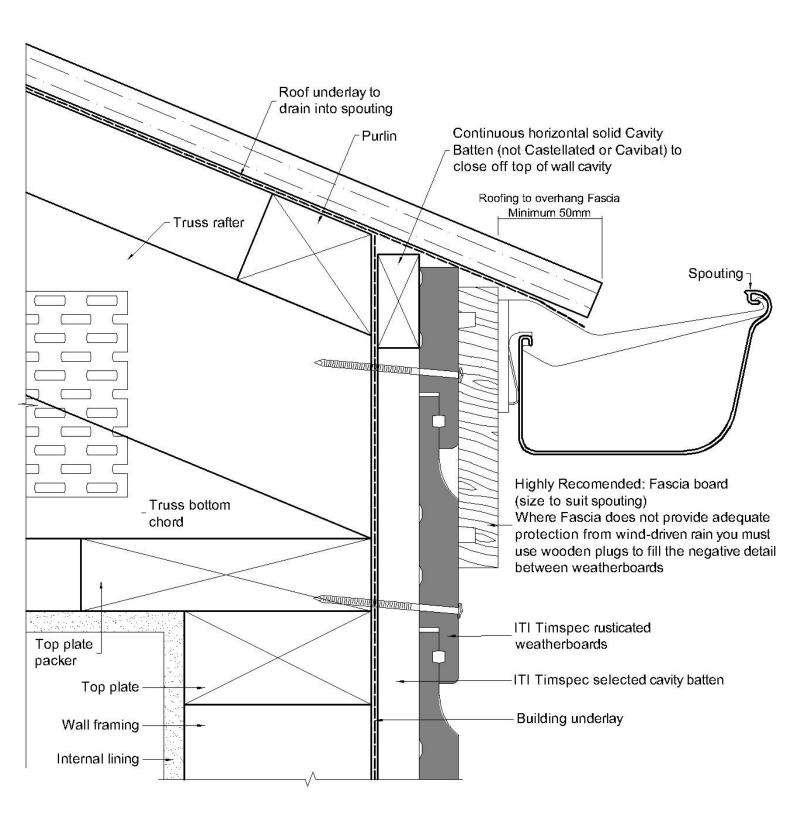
17 RC 601 ROOF/ WALL TOP PLATE - FLAT SOFFIT
